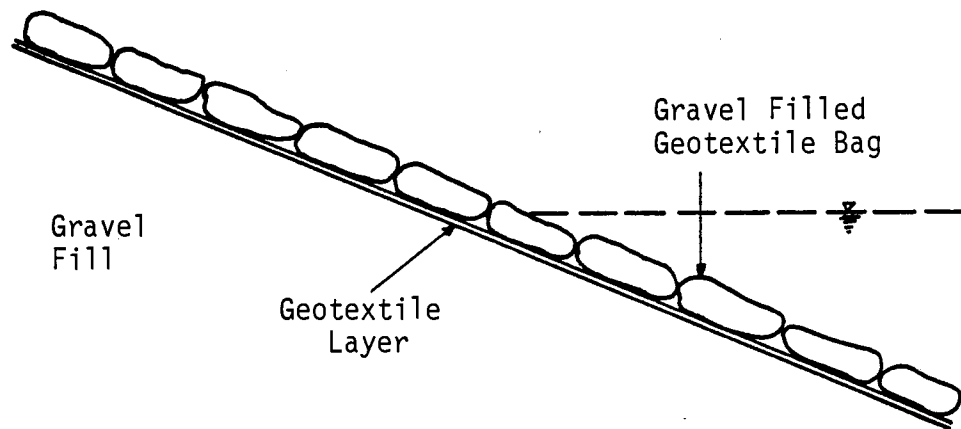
Schematic cross section of Alaskan North Slope gravel island slope using geotextiles for scour protection.
